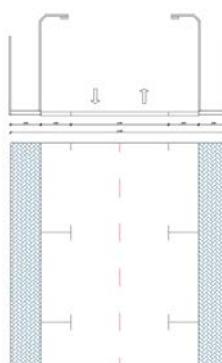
Geometric cross section of streets Planirana 1, Planirana 2, Planirana 3,
